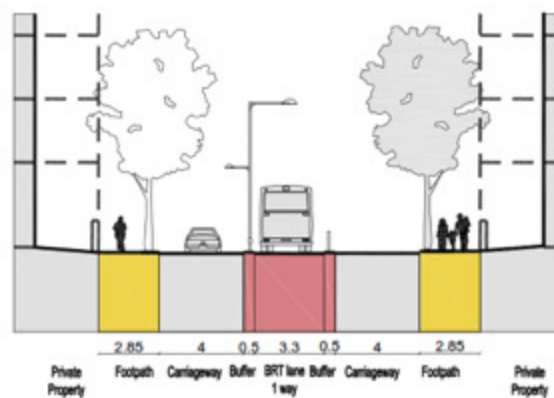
Radium Road to Karamtoli: 18 m BRT corridor sections with one way BRT lane and two way mixed traffic lanes without a BRT station.
